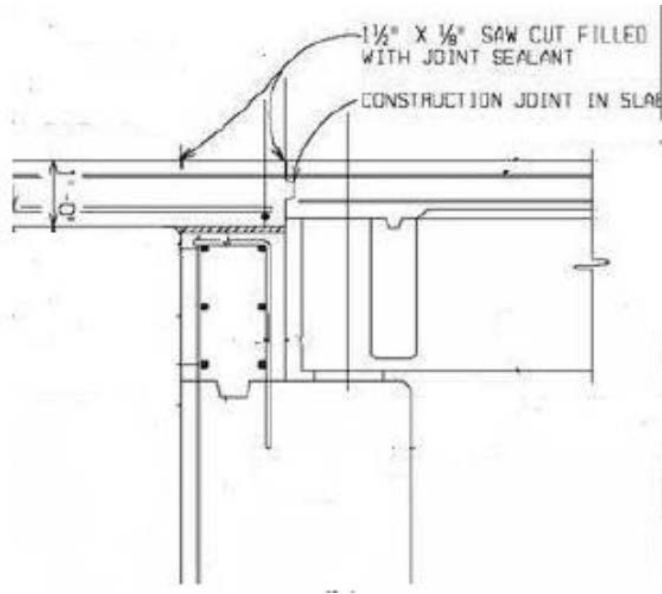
Deck extension detail in MDOT. Source: Miller and Jahren, 2015.
